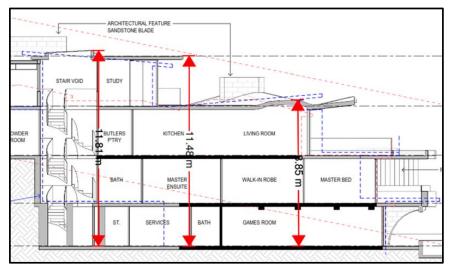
Extract Section plan (Dwg DA-301/P4) of the development with measurements to existing ground levels (ie RL 3.8m AHD of lower ground floor)
